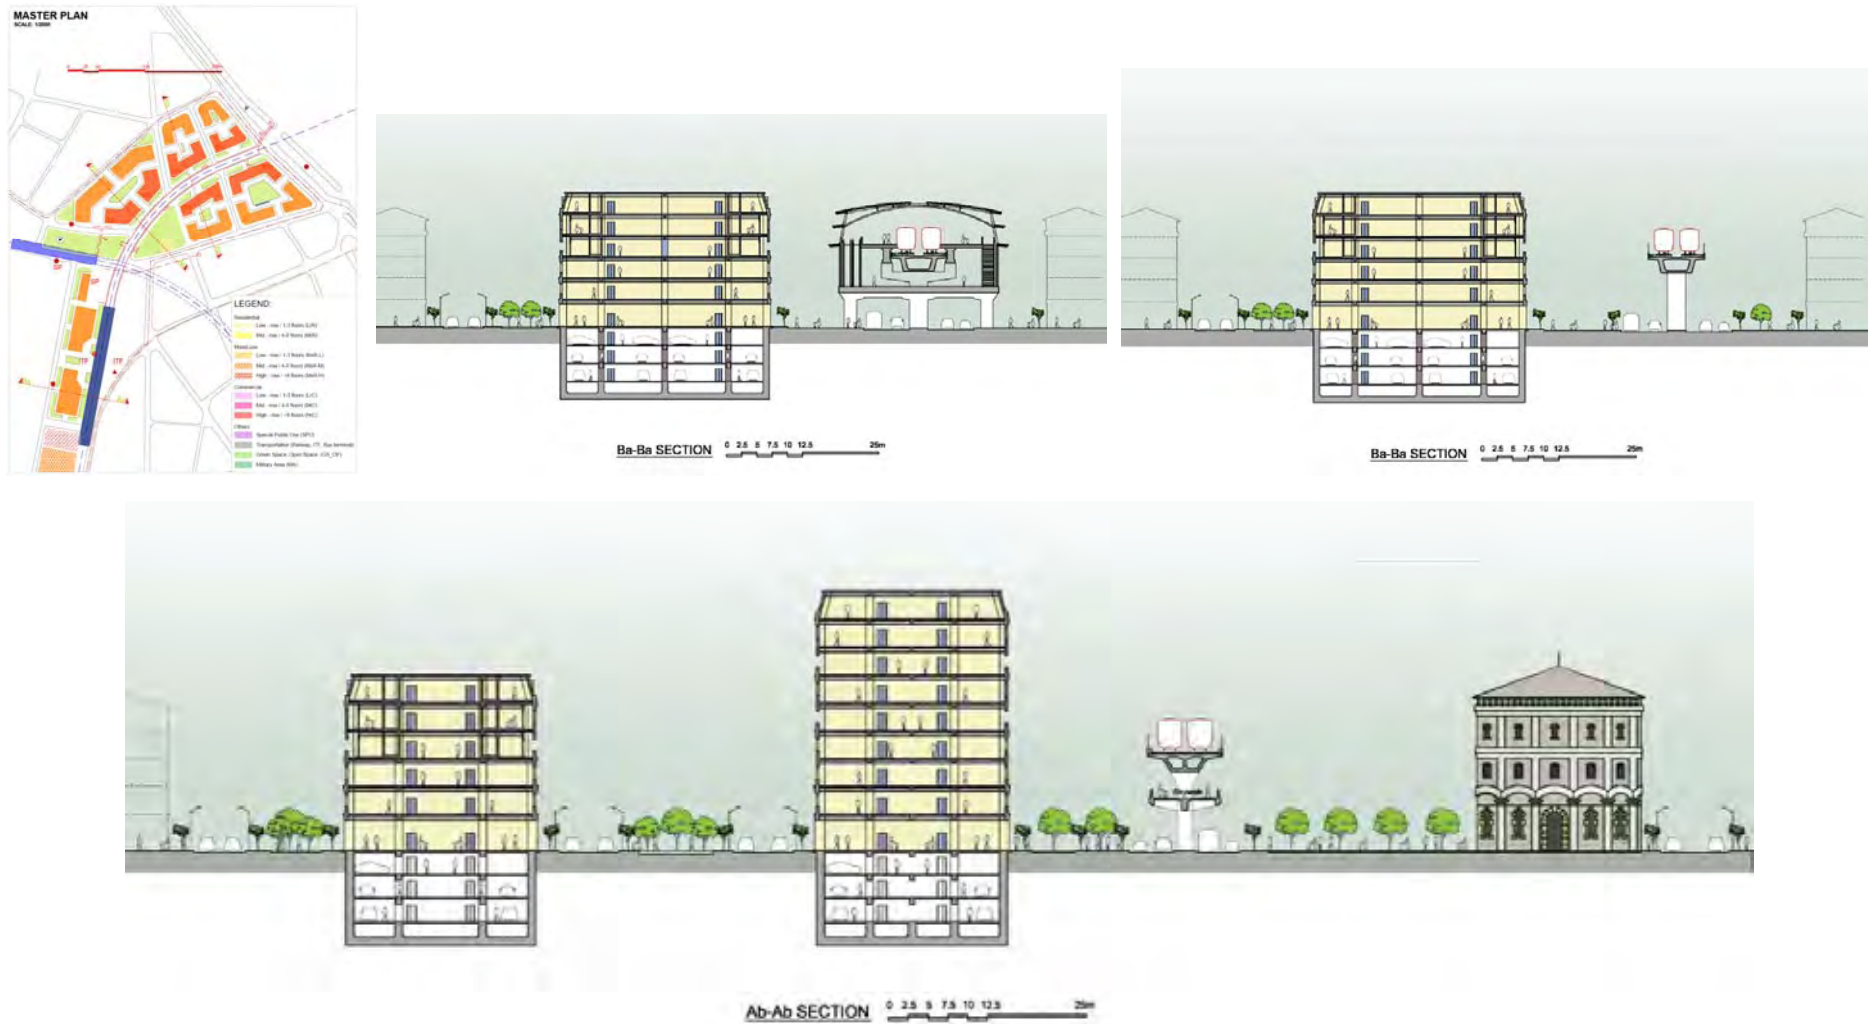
Section Plans of Nam Cau Long Bien and Hang Dau Station Area
